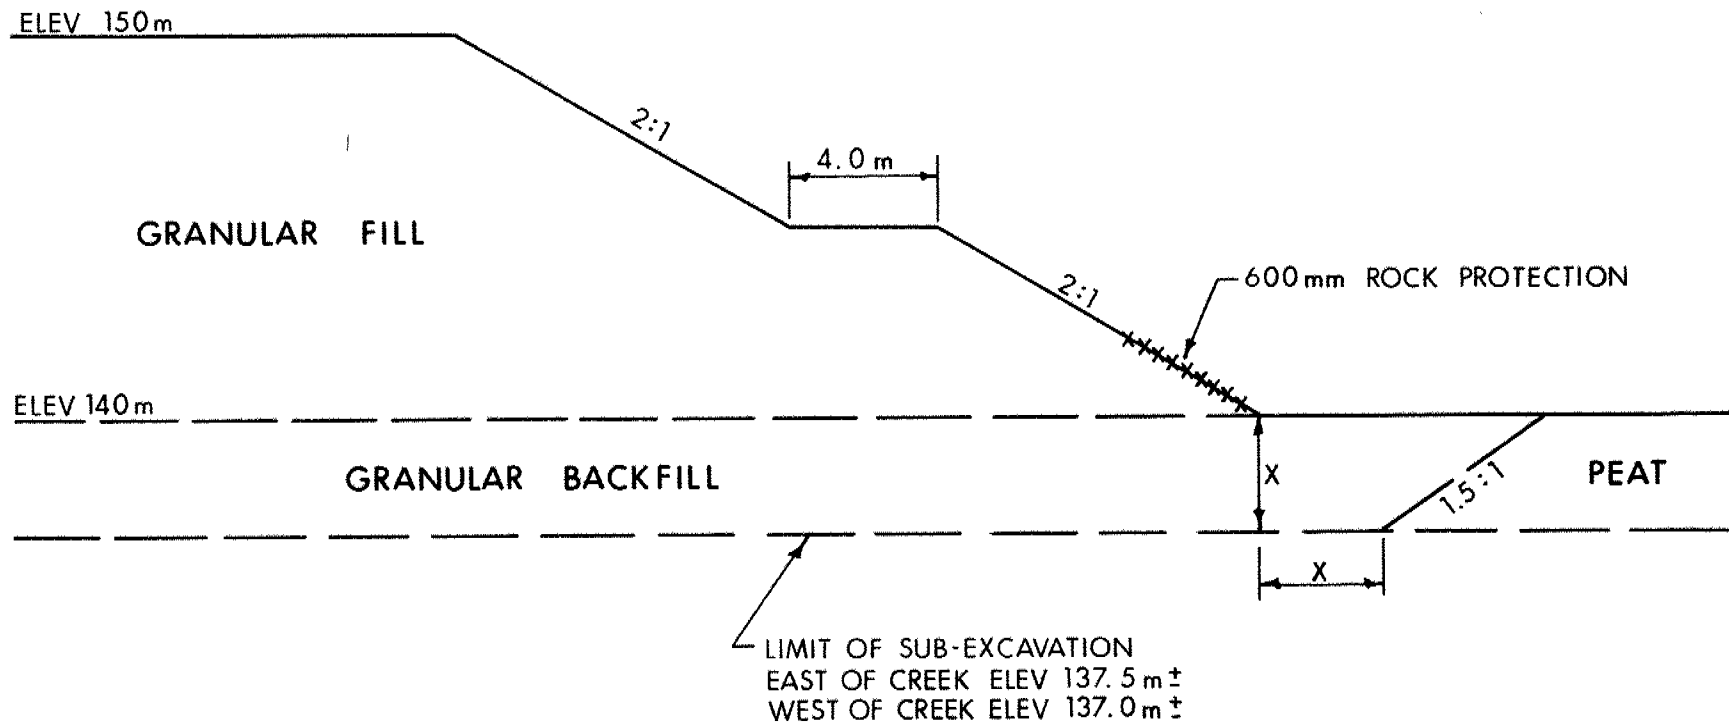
SLOPE GEOMETRY & SUB-EXCAVATION DETAIL
